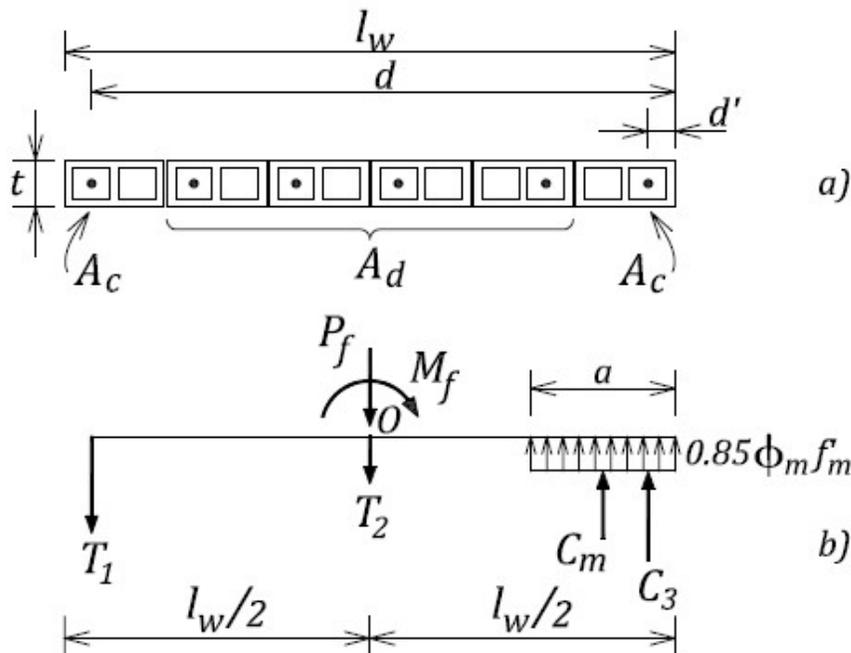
A simplified design model for rectangular wall section: a) plan view cross-section showing reinforcement; b) internal force distribution.
